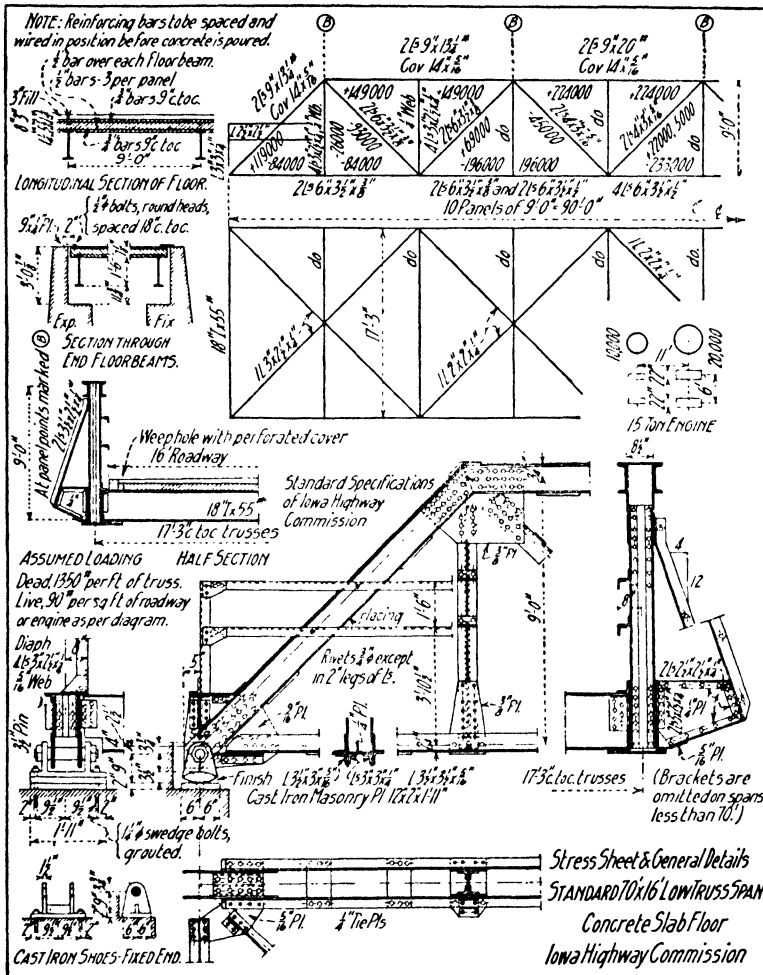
LOW TRUSS SPAN WITHOUT STRINGERS.
